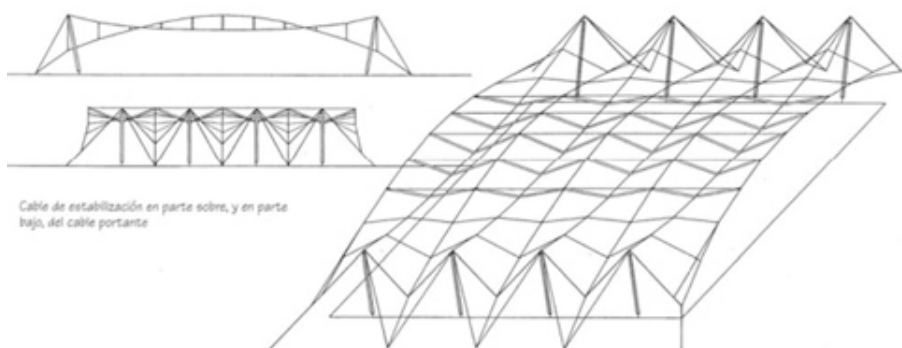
Stabilization cables partly up and partly down, of the supporting cable. [17]
